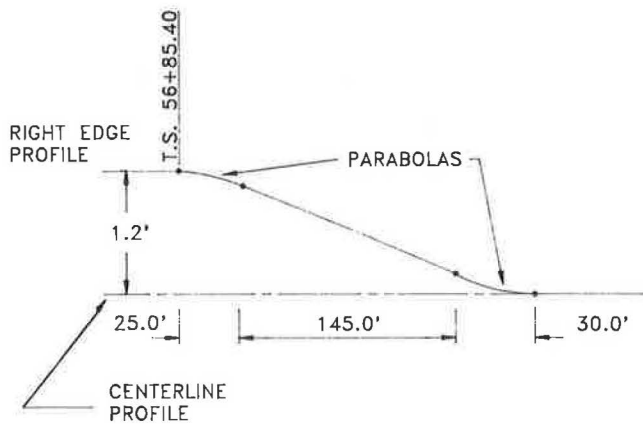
Ending superelevation transition (Type 2) of example ramp.
